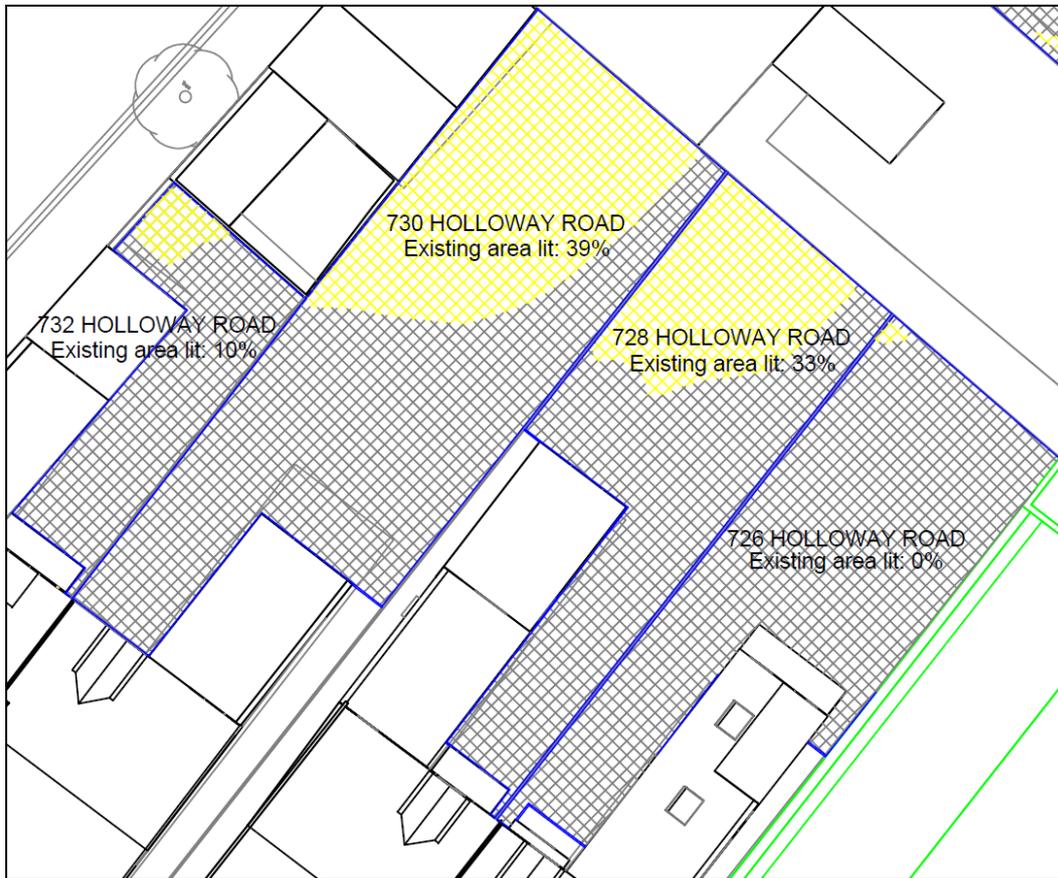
Existing 'sunlight on ground' to neighbouring properties on Holloway Road.
